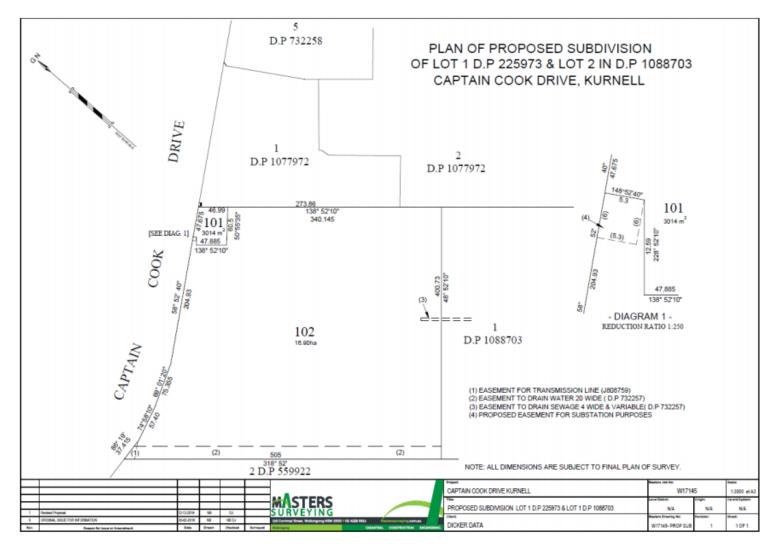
Plan of Subdivision Lot 1 DP 225973 and Lot 2 DP 1088703
